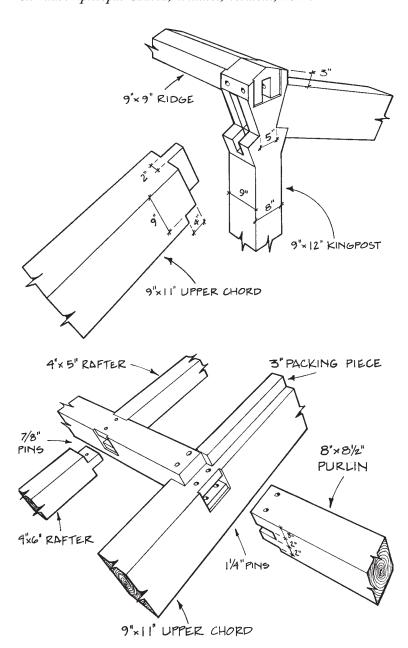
KINGPOST AND PURLIN CONNECTION DETAILS, ST. PAUL'S.
